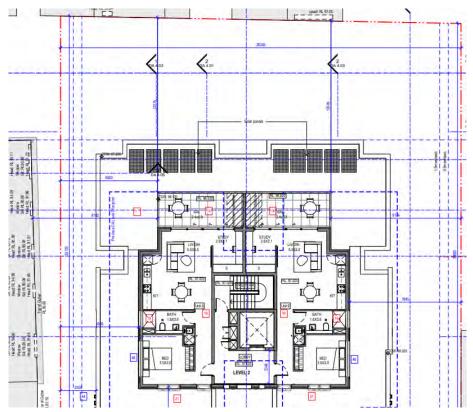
Original approved Level 2 floor plan (amended plan) based on s34 agreement – DA-88/2019
